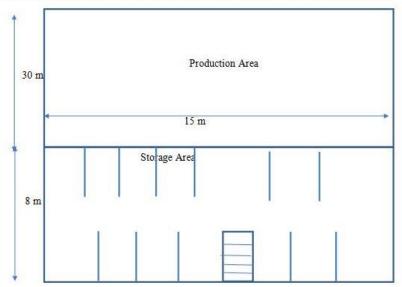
LAYOUT PRODUCTION AREA AND STORAGE AREA²²
